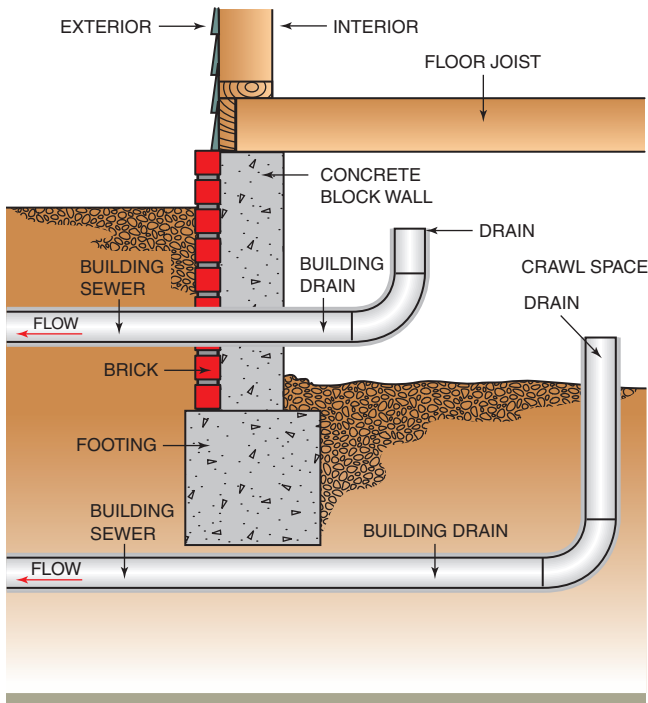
Piping exiting a crawl space is either through the concrete block wall or below the concrete footing.
